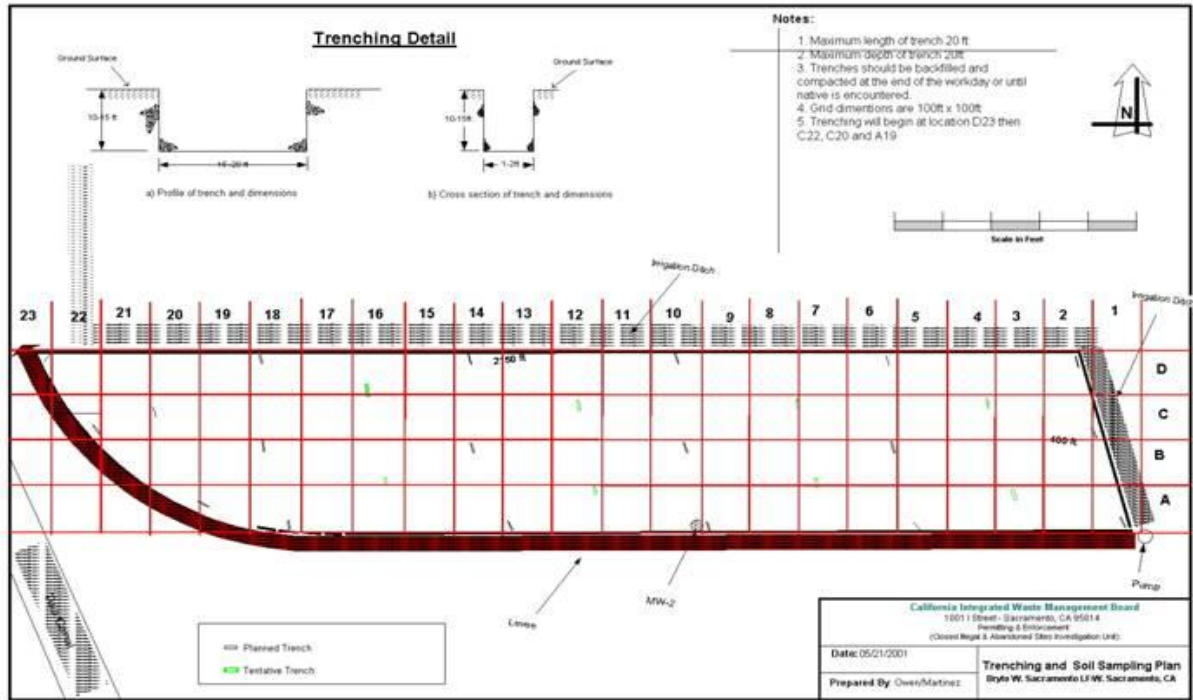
A trench location plan used to determine the horizontal and vertical extent, and cover thickness of a disposal site
